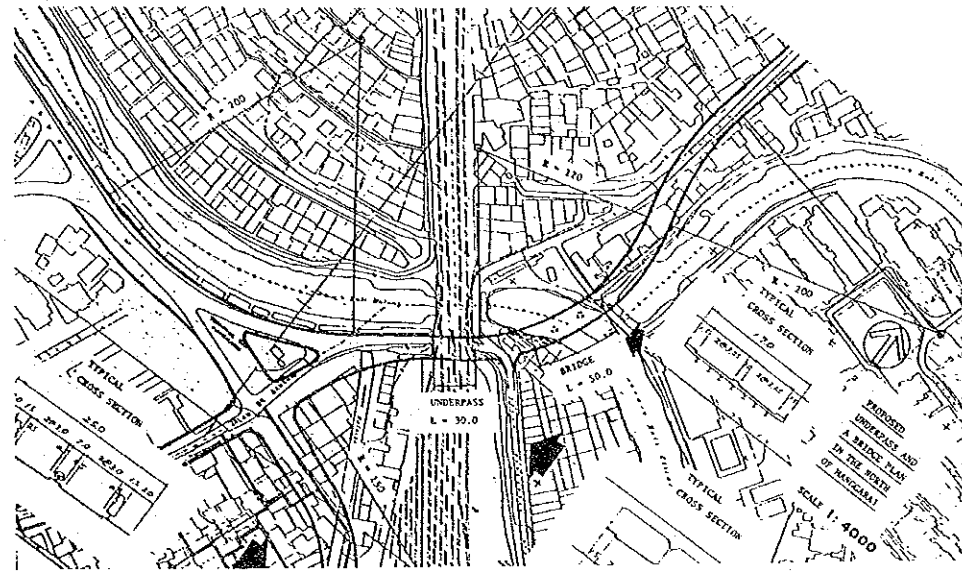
PROPOSED UNDERPASS & BRIDGE PLAN IN THE NORTH OF MANGGARAI
